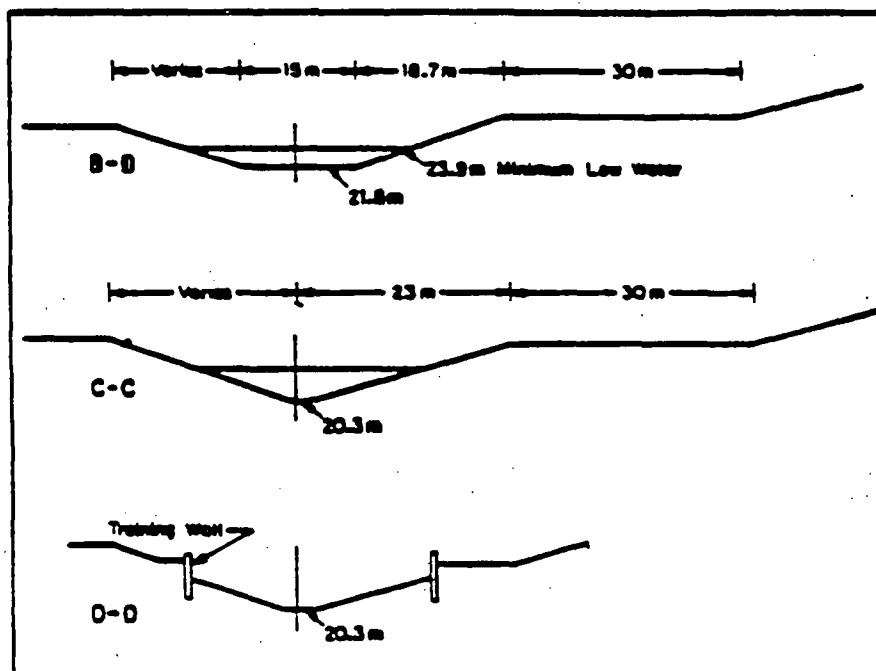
Cross Sections of 3G Canal at Points Designated in Figure 2-5
